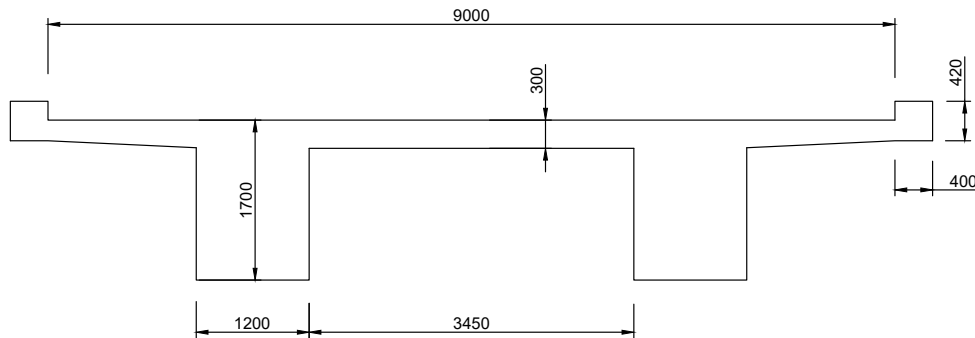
Cross-section of Östrand road bridge, with measurements in mm.
